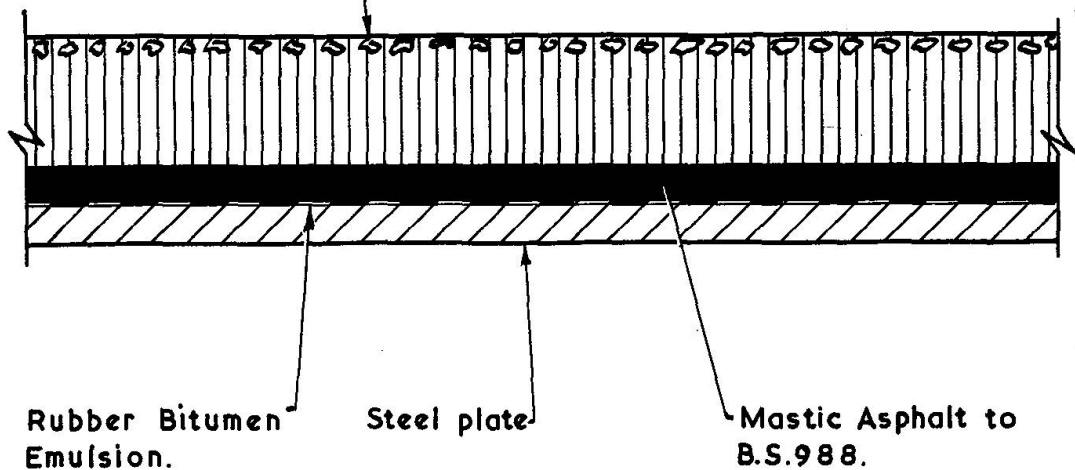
SURFACING OF SWING BRIDGE AT REGENTS CANAL DOCK, LONDON.
